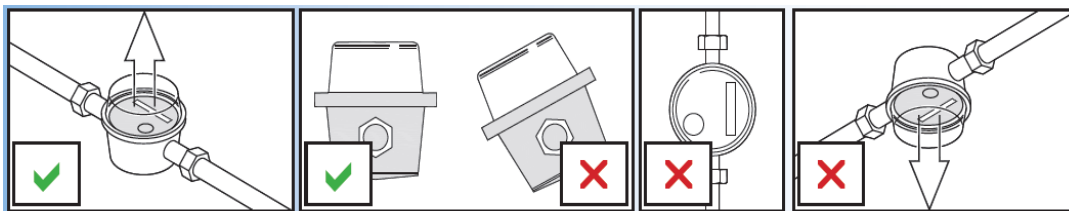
Extract from Manufacturer's Installation Instructions¹⁶
